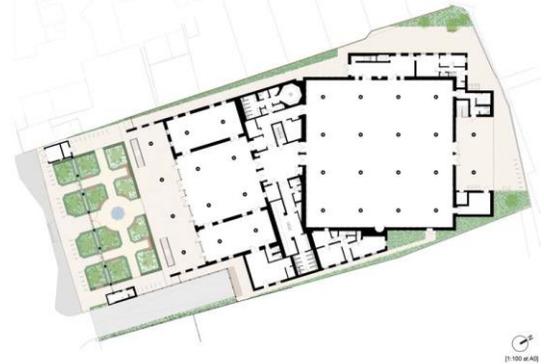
Site Plan — Cambridge Central Mosque © Marks Barfield Architects (www-1)
